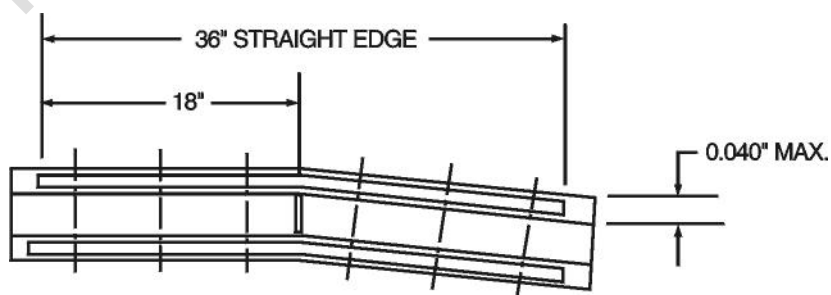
Plan View of Joint Showing Misalignment Tolerance in Horizontal Alignment per Article 3.8.6.2
